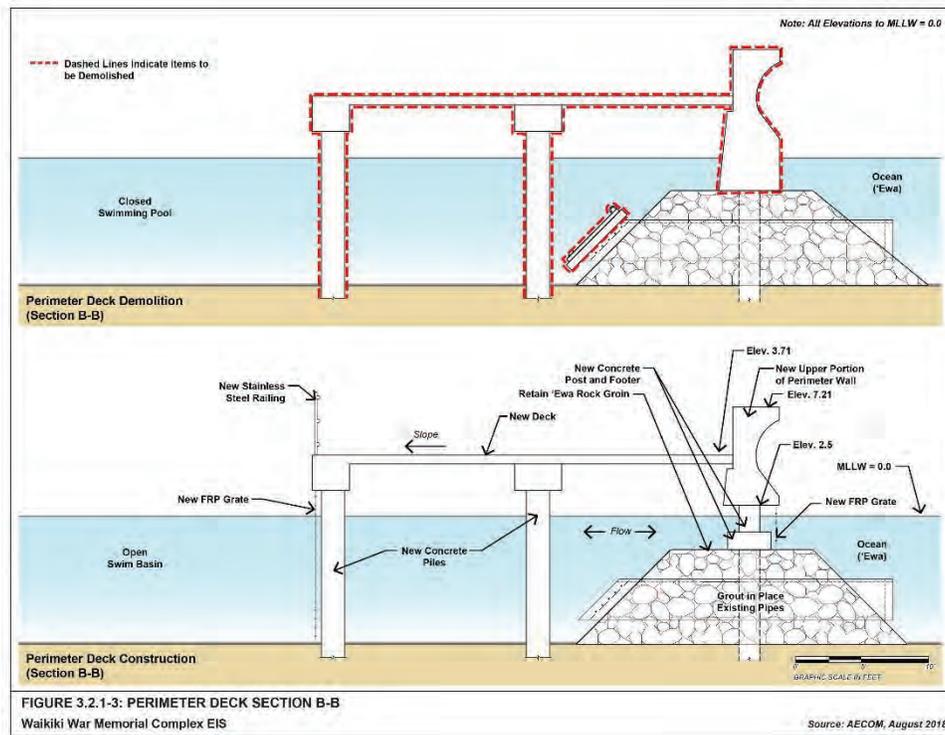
Alternative 1 – Perimeter Deck, section view B-B.
